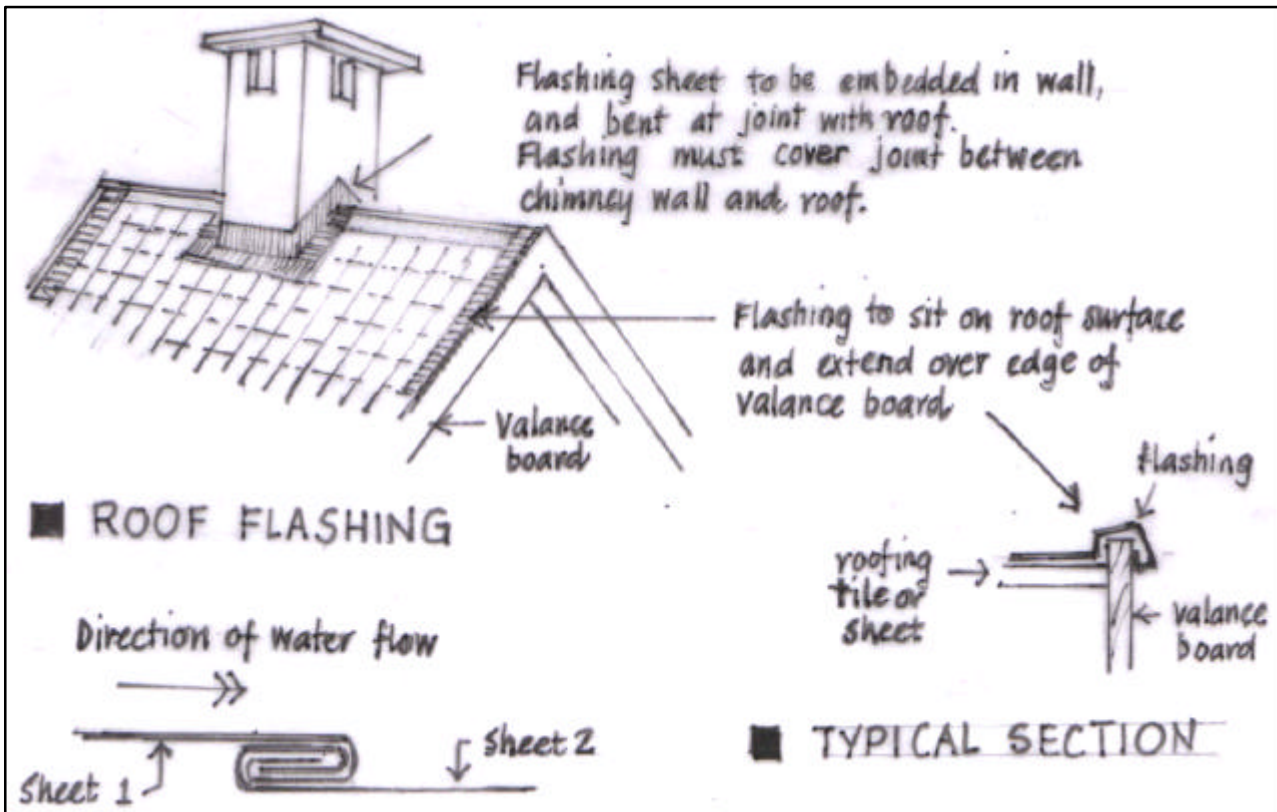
G1 & Zinc flashing and joints for roof and gutters (not to scale)
